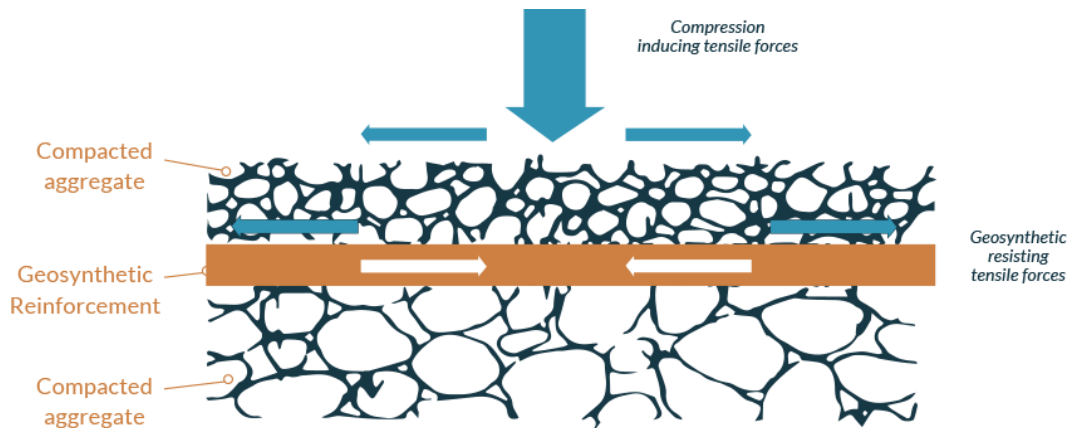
Geotextile Working as Reinforcement (Randall MFG, 2023)
